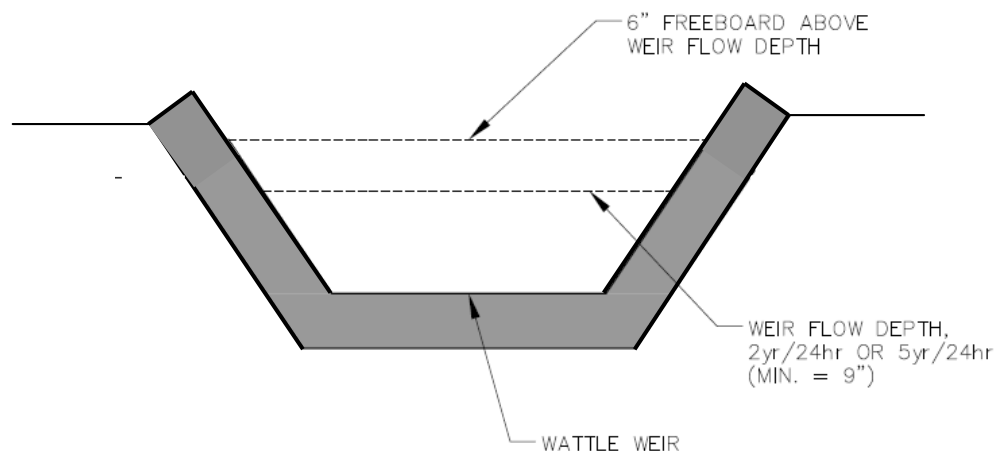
Cross sectional view of wattle installed in ditch
